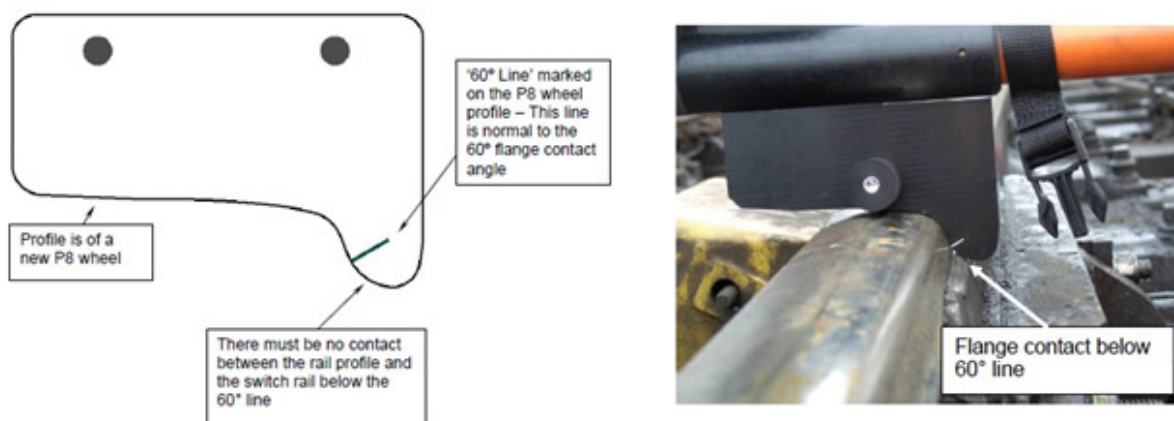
Drawing of TGP8 gauge (left); example of failed TGP8 inspection (right)
